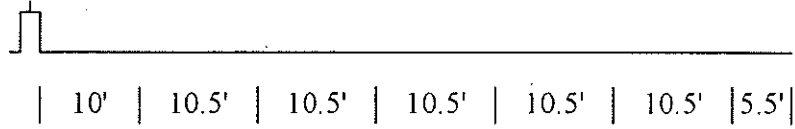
Configuration No. 2 -- Restriping to use the right shoulder as a travel lane (1).
